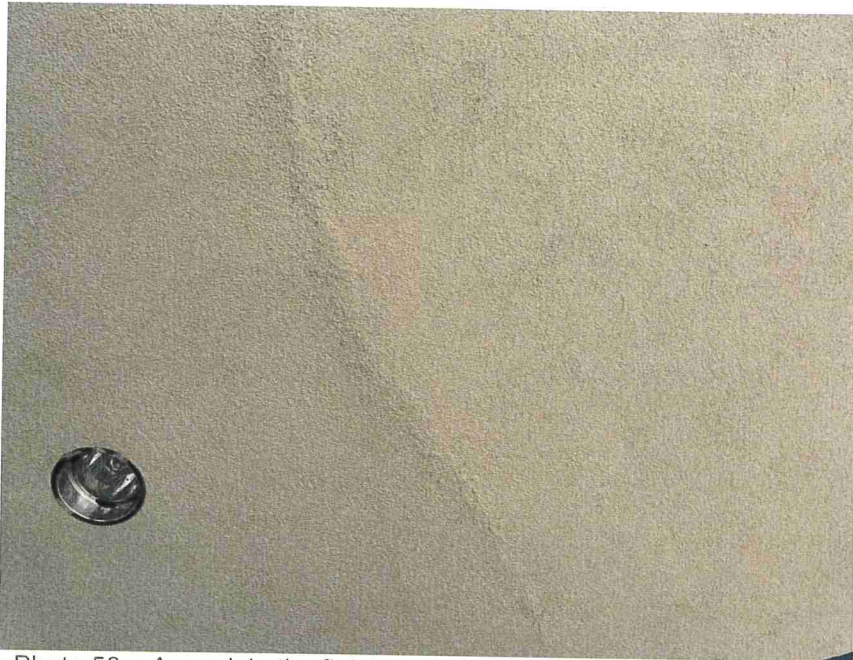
A crack in the finish was observed at the underside of the south canopy. No stains were visible.
